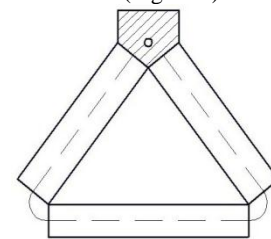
Scheme concreting monolithic sections of the beam for post-rection installation
